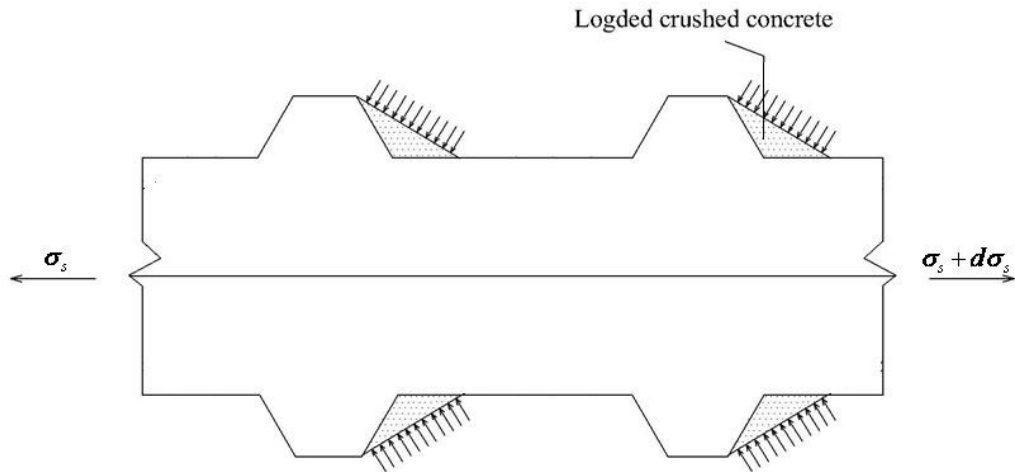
Crushing of concrete surrounding deformed steel bar
